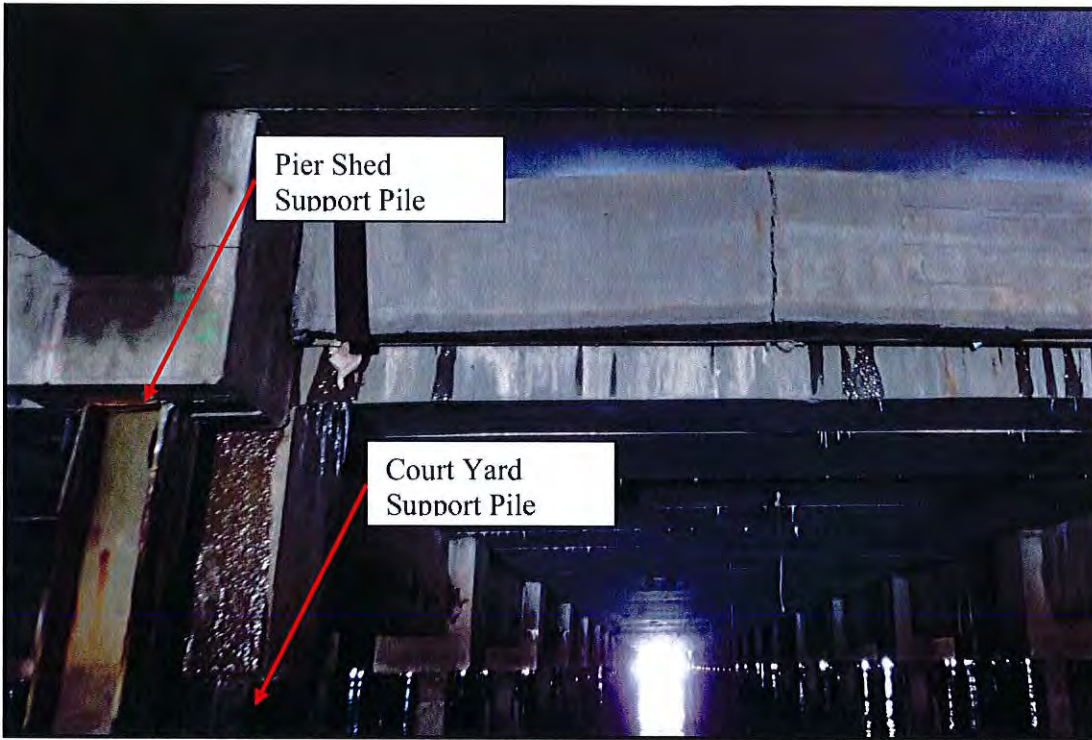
Interface between Pier Shed and Court Yard. Note the difference in exposed pile length.
